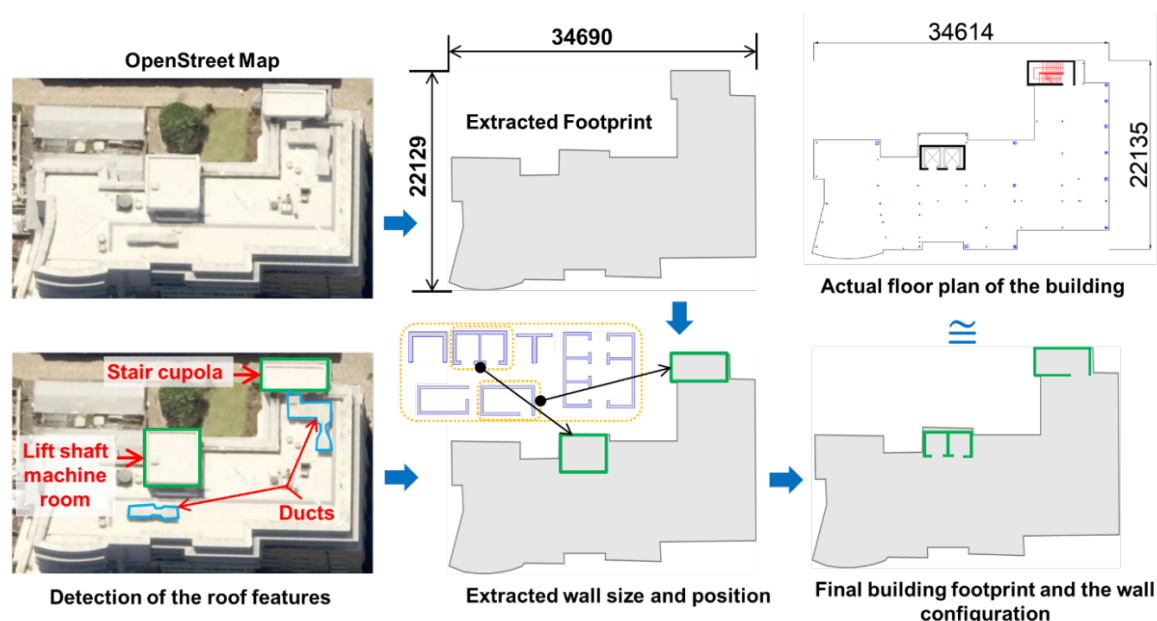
Example of the extraction of the floor plan and structural details from one of the case study buildings.
